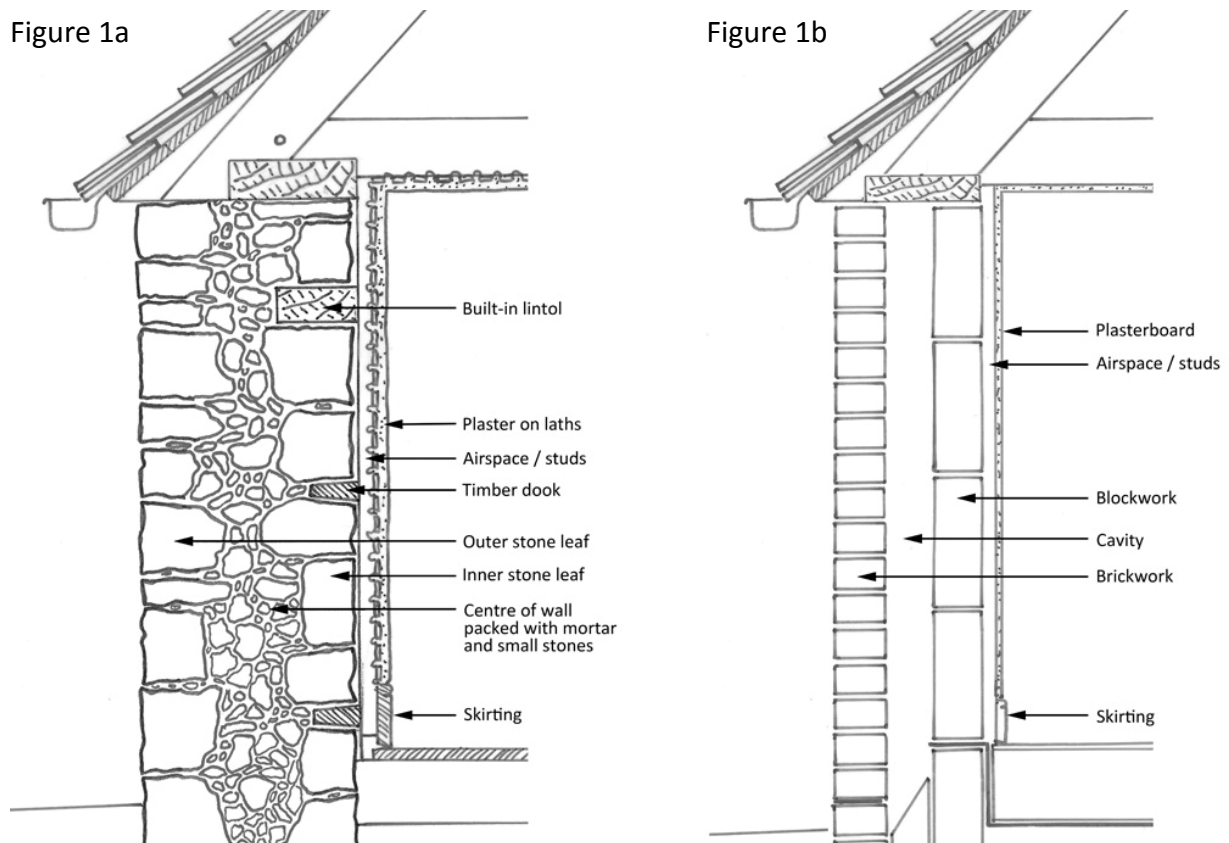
Comparison of (a) traditional solid masonry wall construction and (b) non-traditional cavity wall construction
